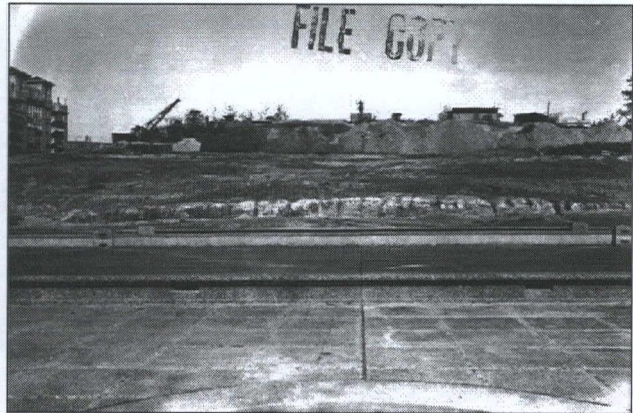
View north from the lower plaza before construction of the great wall and cascades (RCP-CRF, March 14, 1932).
